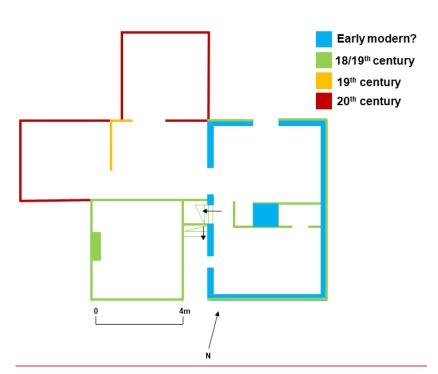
Schematic phased ground floor plan of 12 Bell Lane. Not metrically accurate.
